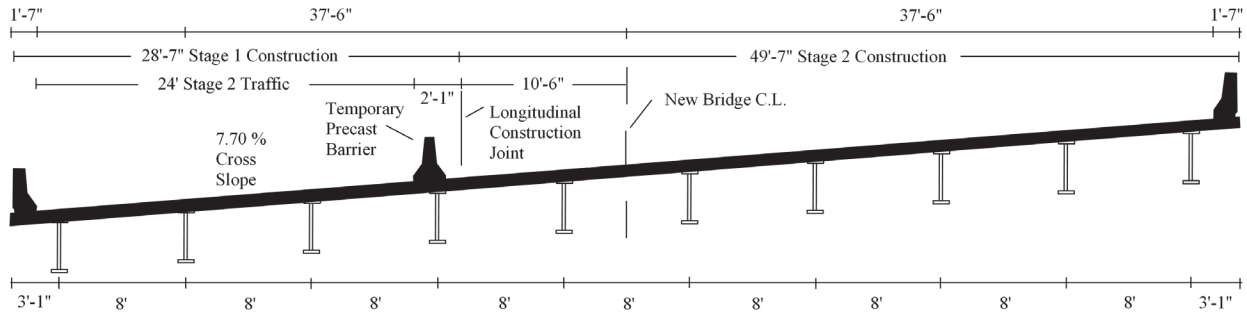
Bridge No. 07364 Cross Section from Design Plans
